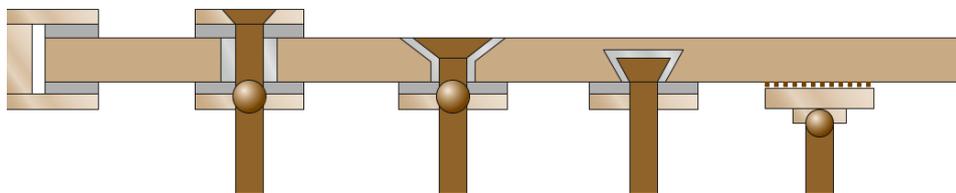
Various point fixings. From left to right, clamped on the side, a glass piercing point fixing, pierced and chamfered hole, countersunk (embedded) and adhesive based. [18]
